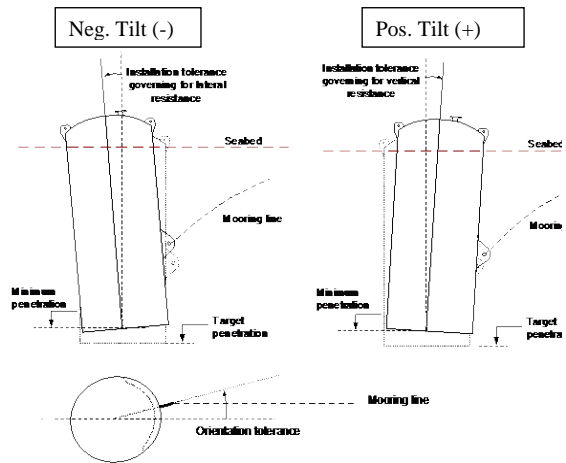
PILE TILT AND MIS-ORIENTATION DURING INSTALLATION
